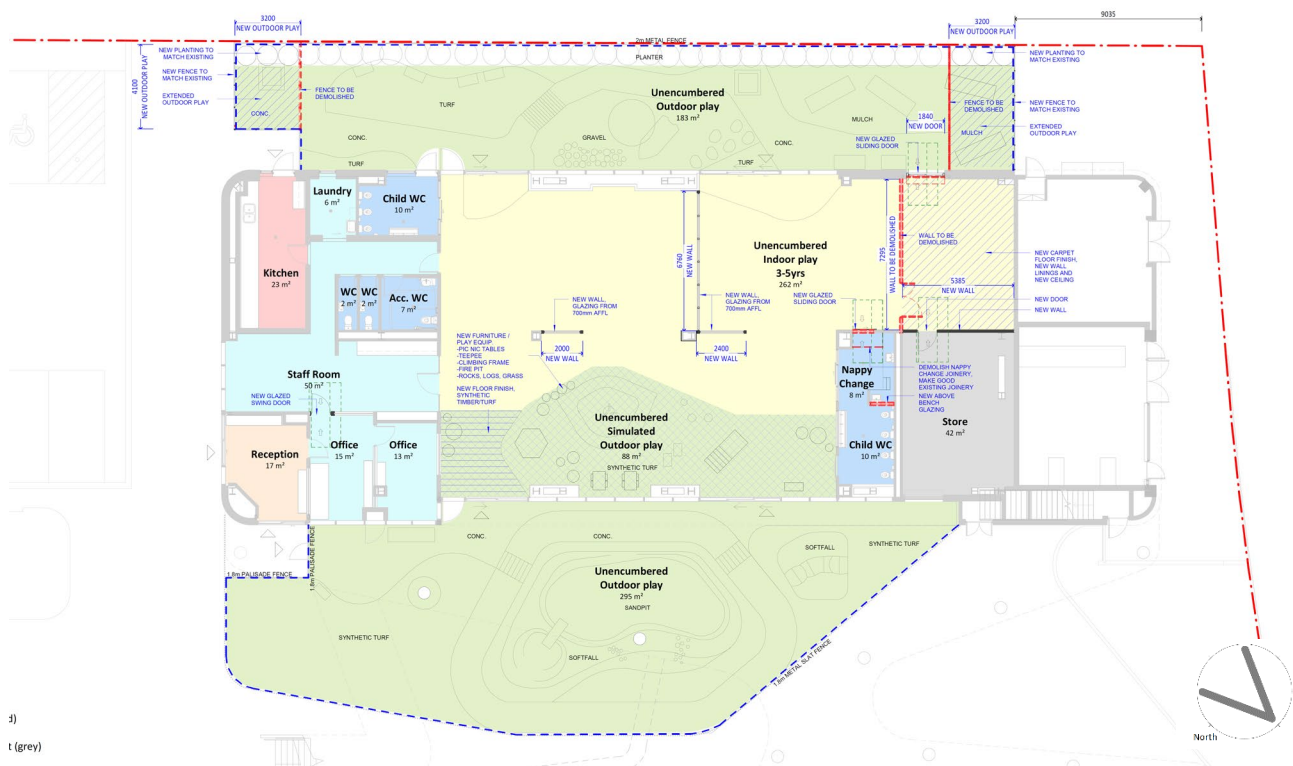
Proposed Floor Plan (Source: Alleanza Architecture)
